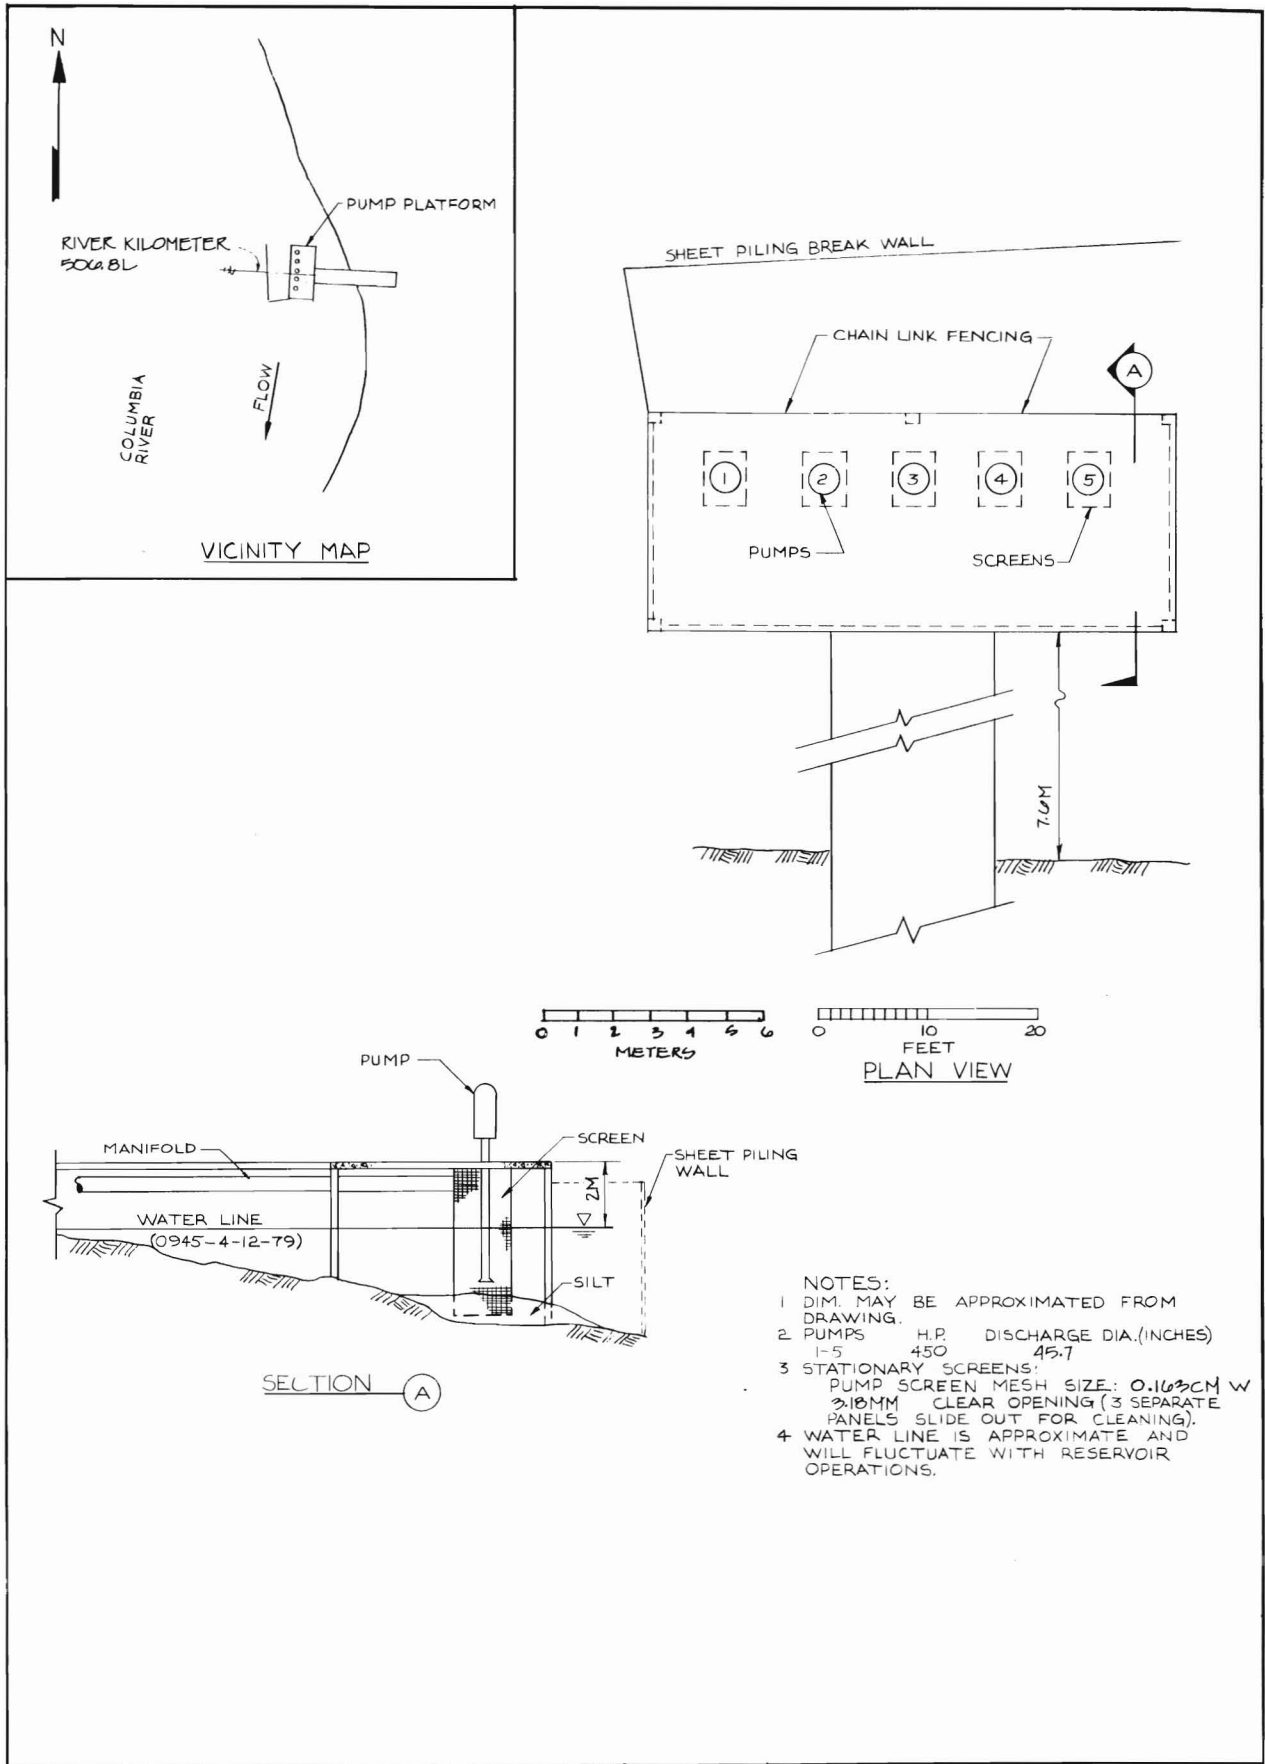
Water withdrawal plan of Nedrow Farms (river mile Col1315.0L).
